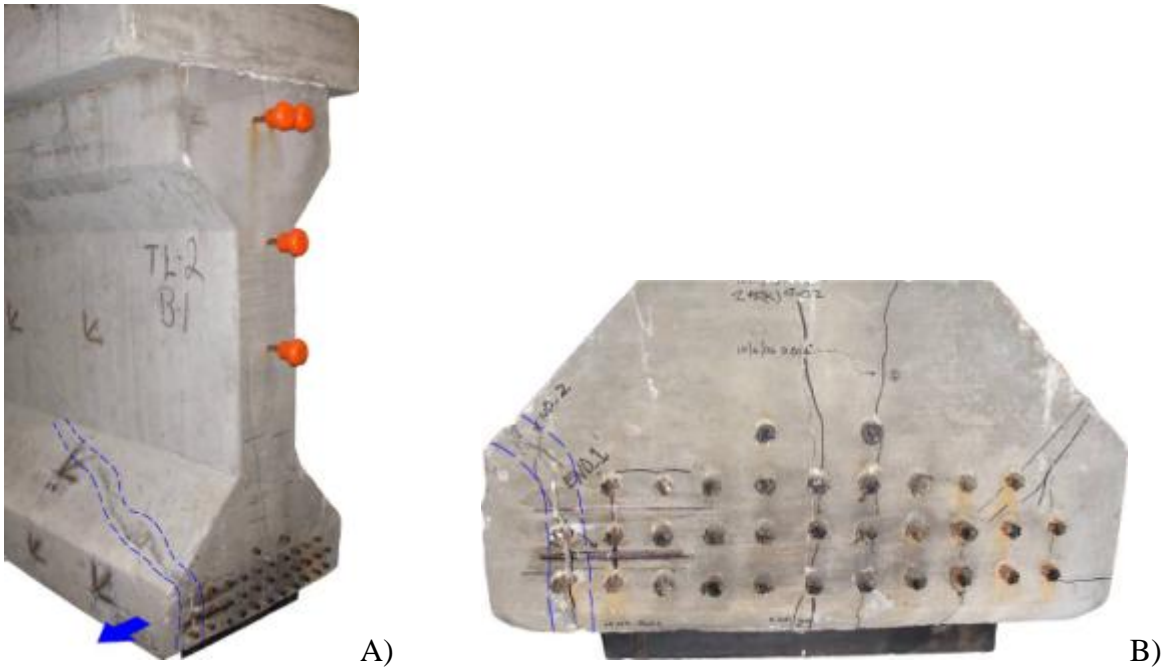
Flange cracking in girder with debonded strands concentrated below web A) side view and B) end view.
